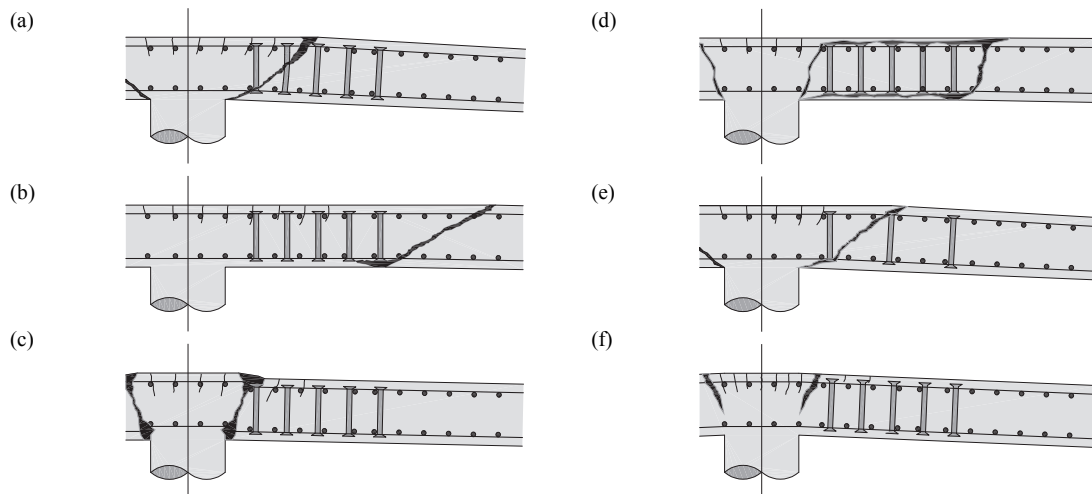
Possible failure modes of slabs with shear reinforcement: (a) failure within shear-reinforced area, (b) failure outside shear-reinforced area, (c) failure close to the column due to crushing of concrete, (d) delamination of the concrete core, (e) failure between the transverse reinforcement, and (f) flexural failure
